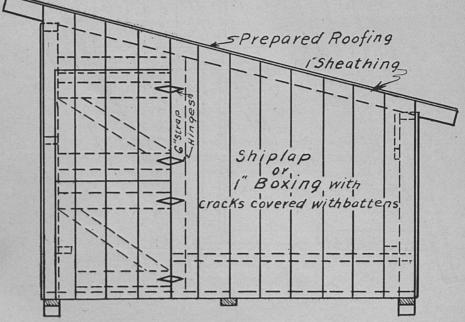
Shed Roof House C 6-39-1, end elevation.
